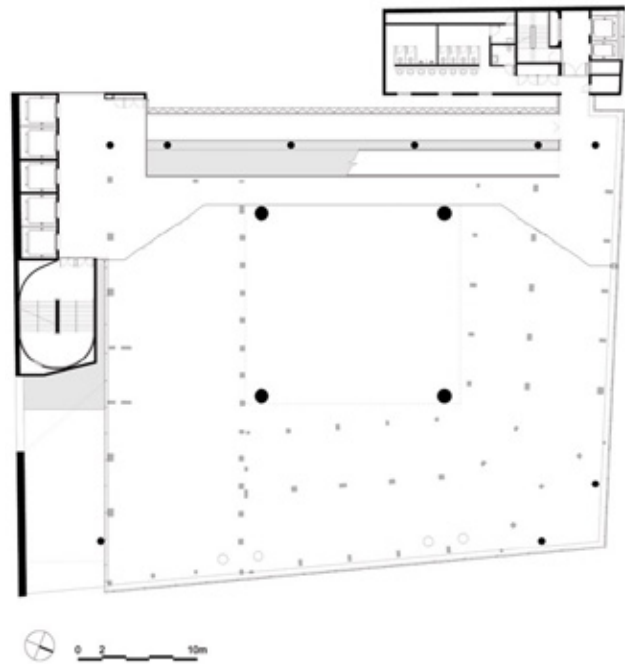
5th floor plan Sesc 24, Paulo Mendes da Rocha + MMBB, 2017
